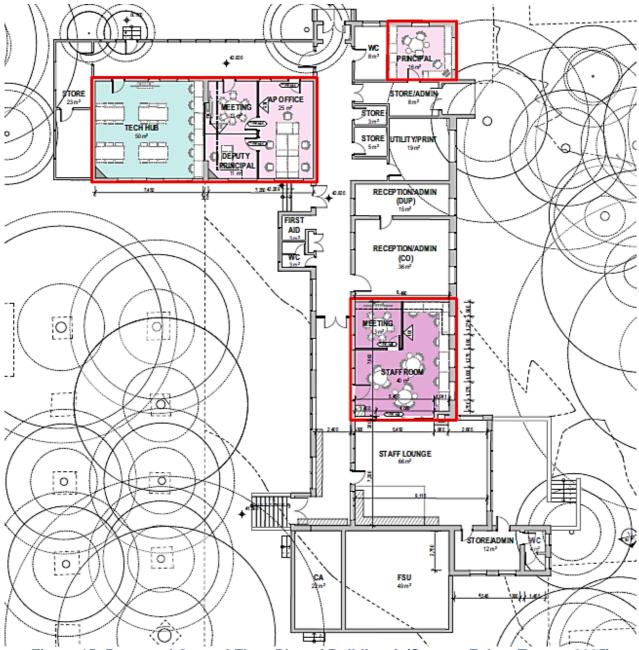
Proposed Ground Floor Plan of Building A (Source: Fulton Trotter, 2025)
